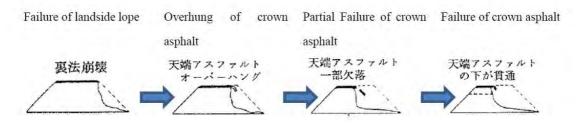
Failure Progress of Crown Asphalt Dike
